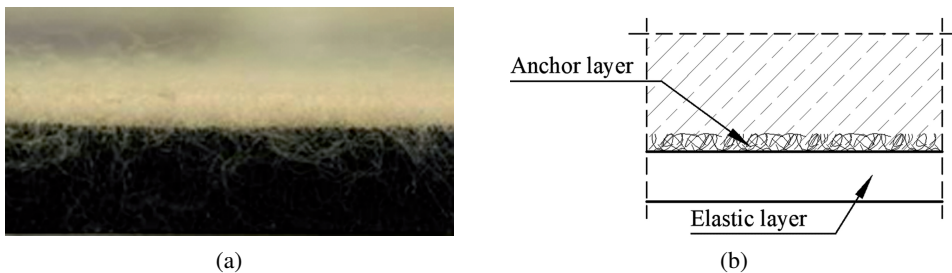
USP with a geotextile anchor layer: (a) section view of the anchor layer (geotextile); (b) anchoring scheme
